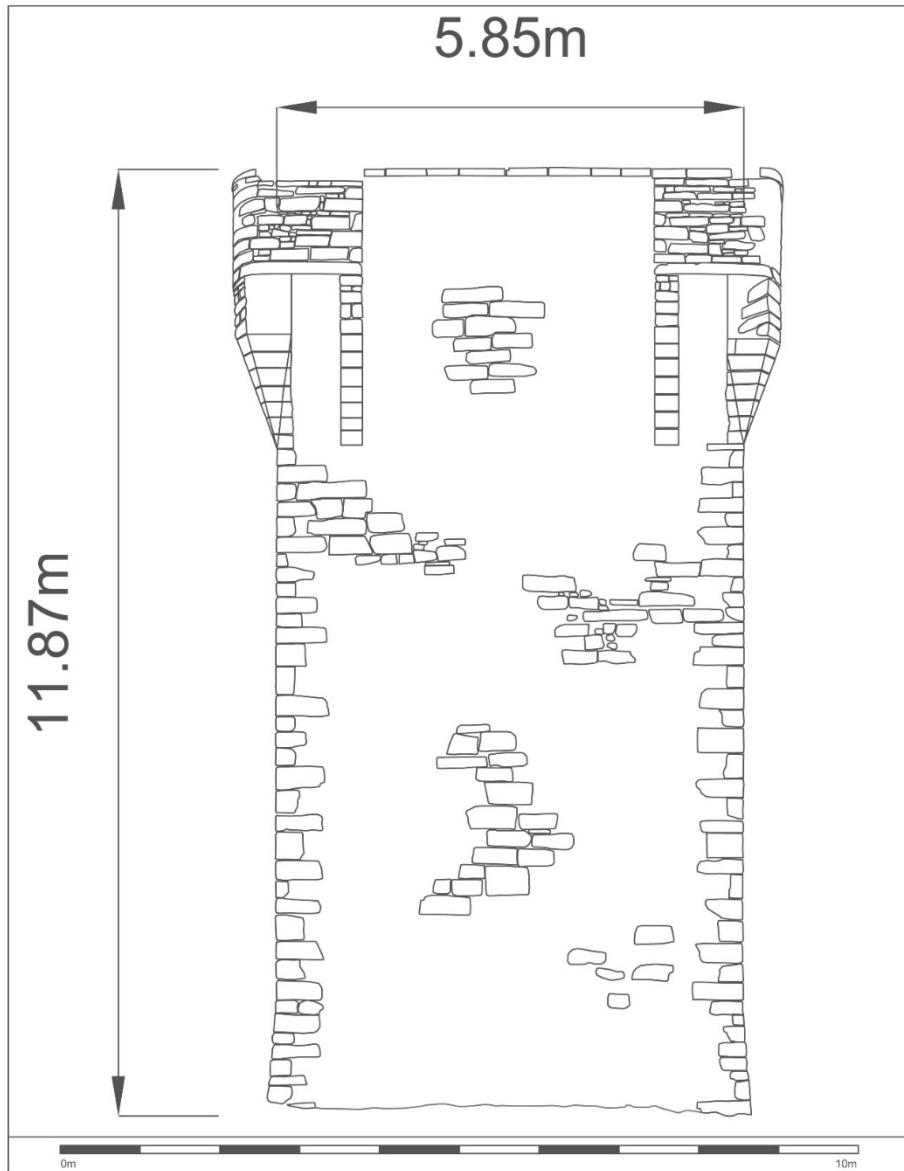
External elevation of the south-east wall of the signal tower at Glen Head Signal Station.
